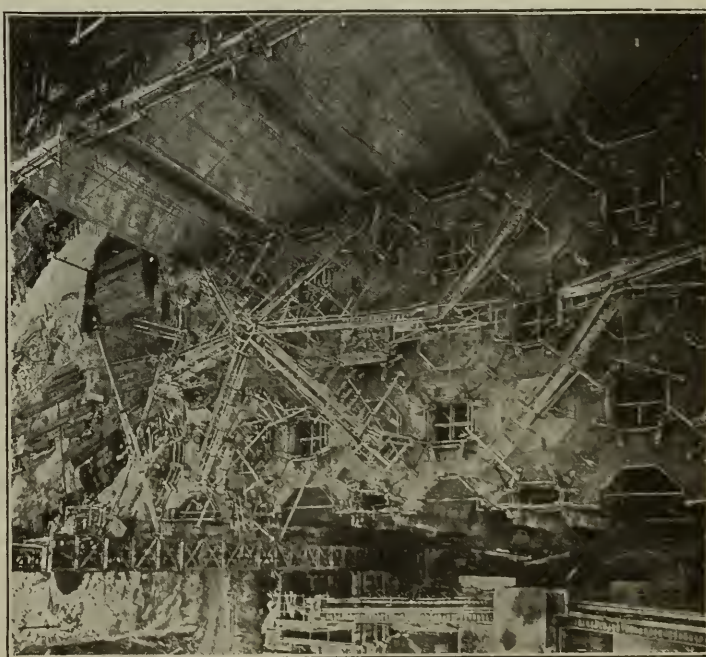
PHOTOGRAPH FROM CONCRETING TOWER SHOWS SPIDERWEB CHUTING SYSTEM AND VERTICAL JOINT THROUGH BINS
